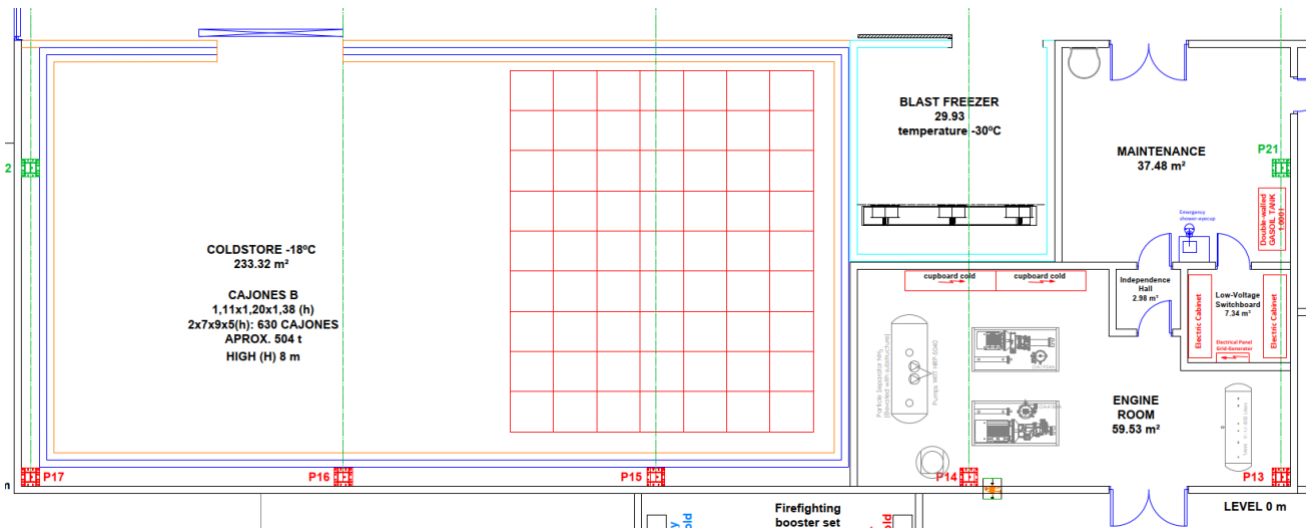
Detailed view of the frozen chamber, blast freezer and cold system machine room
